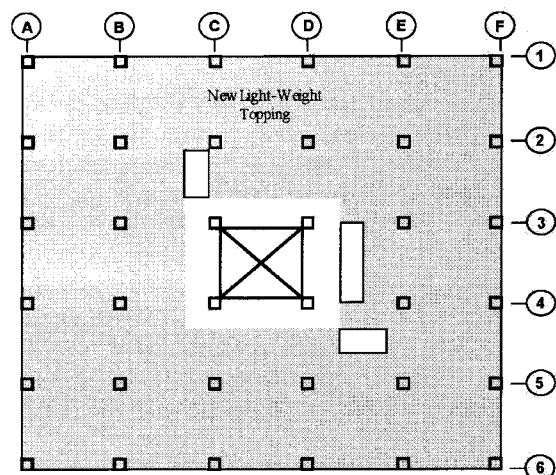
Third Floor Plan Indicating Proposed Areas of Floor Leveling
